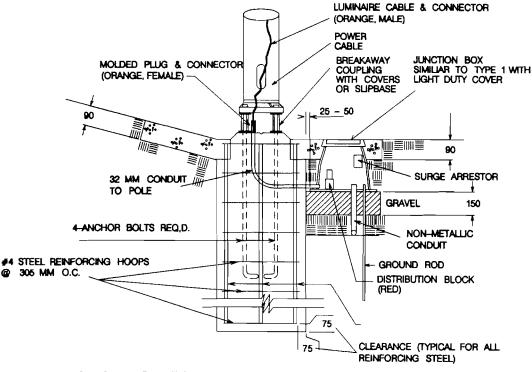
Small base concrete luminaire foundation system with underground modular cable distribution system
